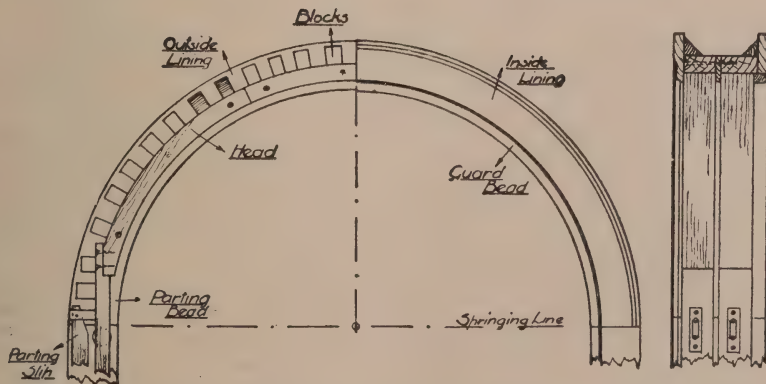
Part Sectional and Side Elevation of Circular-headed Sash and Frame
